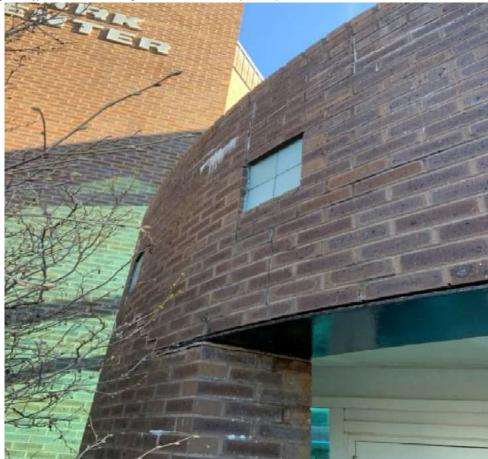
Typical cracks in brick façade, with efflorescence (BEFORE).
